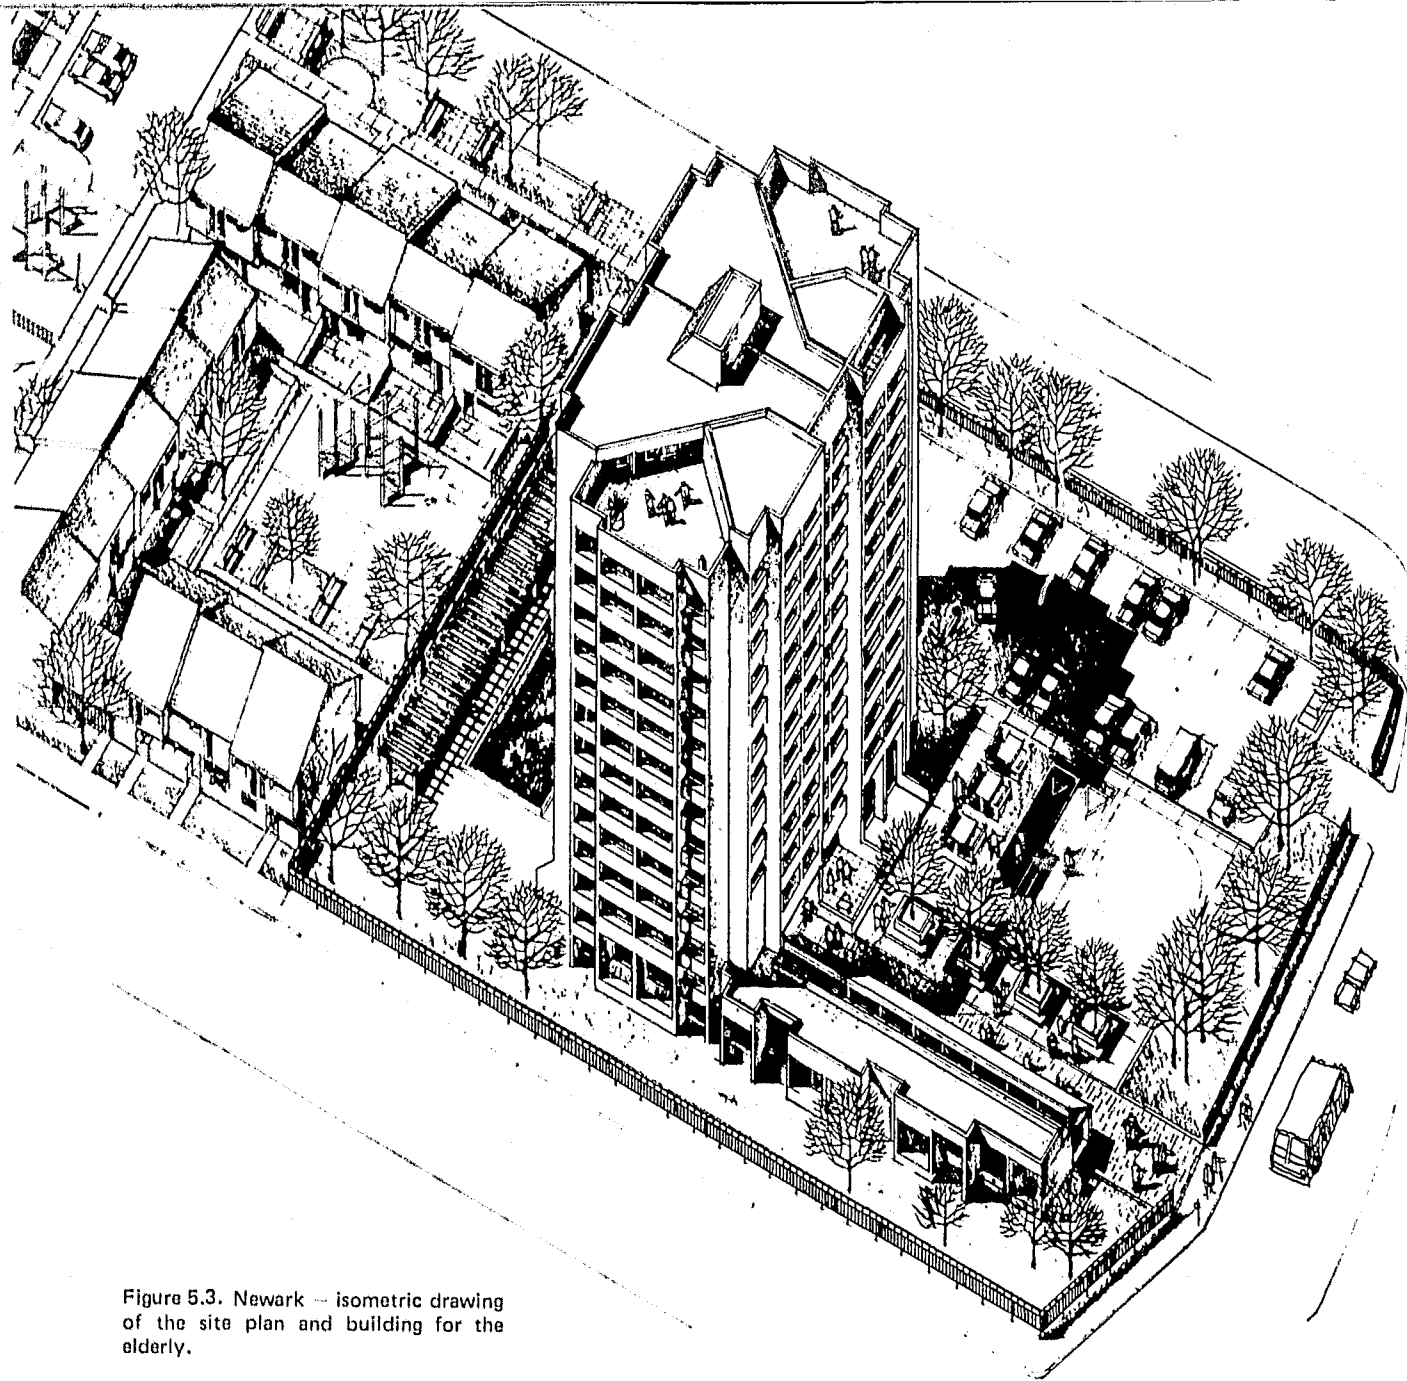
Newark — isometric drawing of the site plan and building for the elderly.
